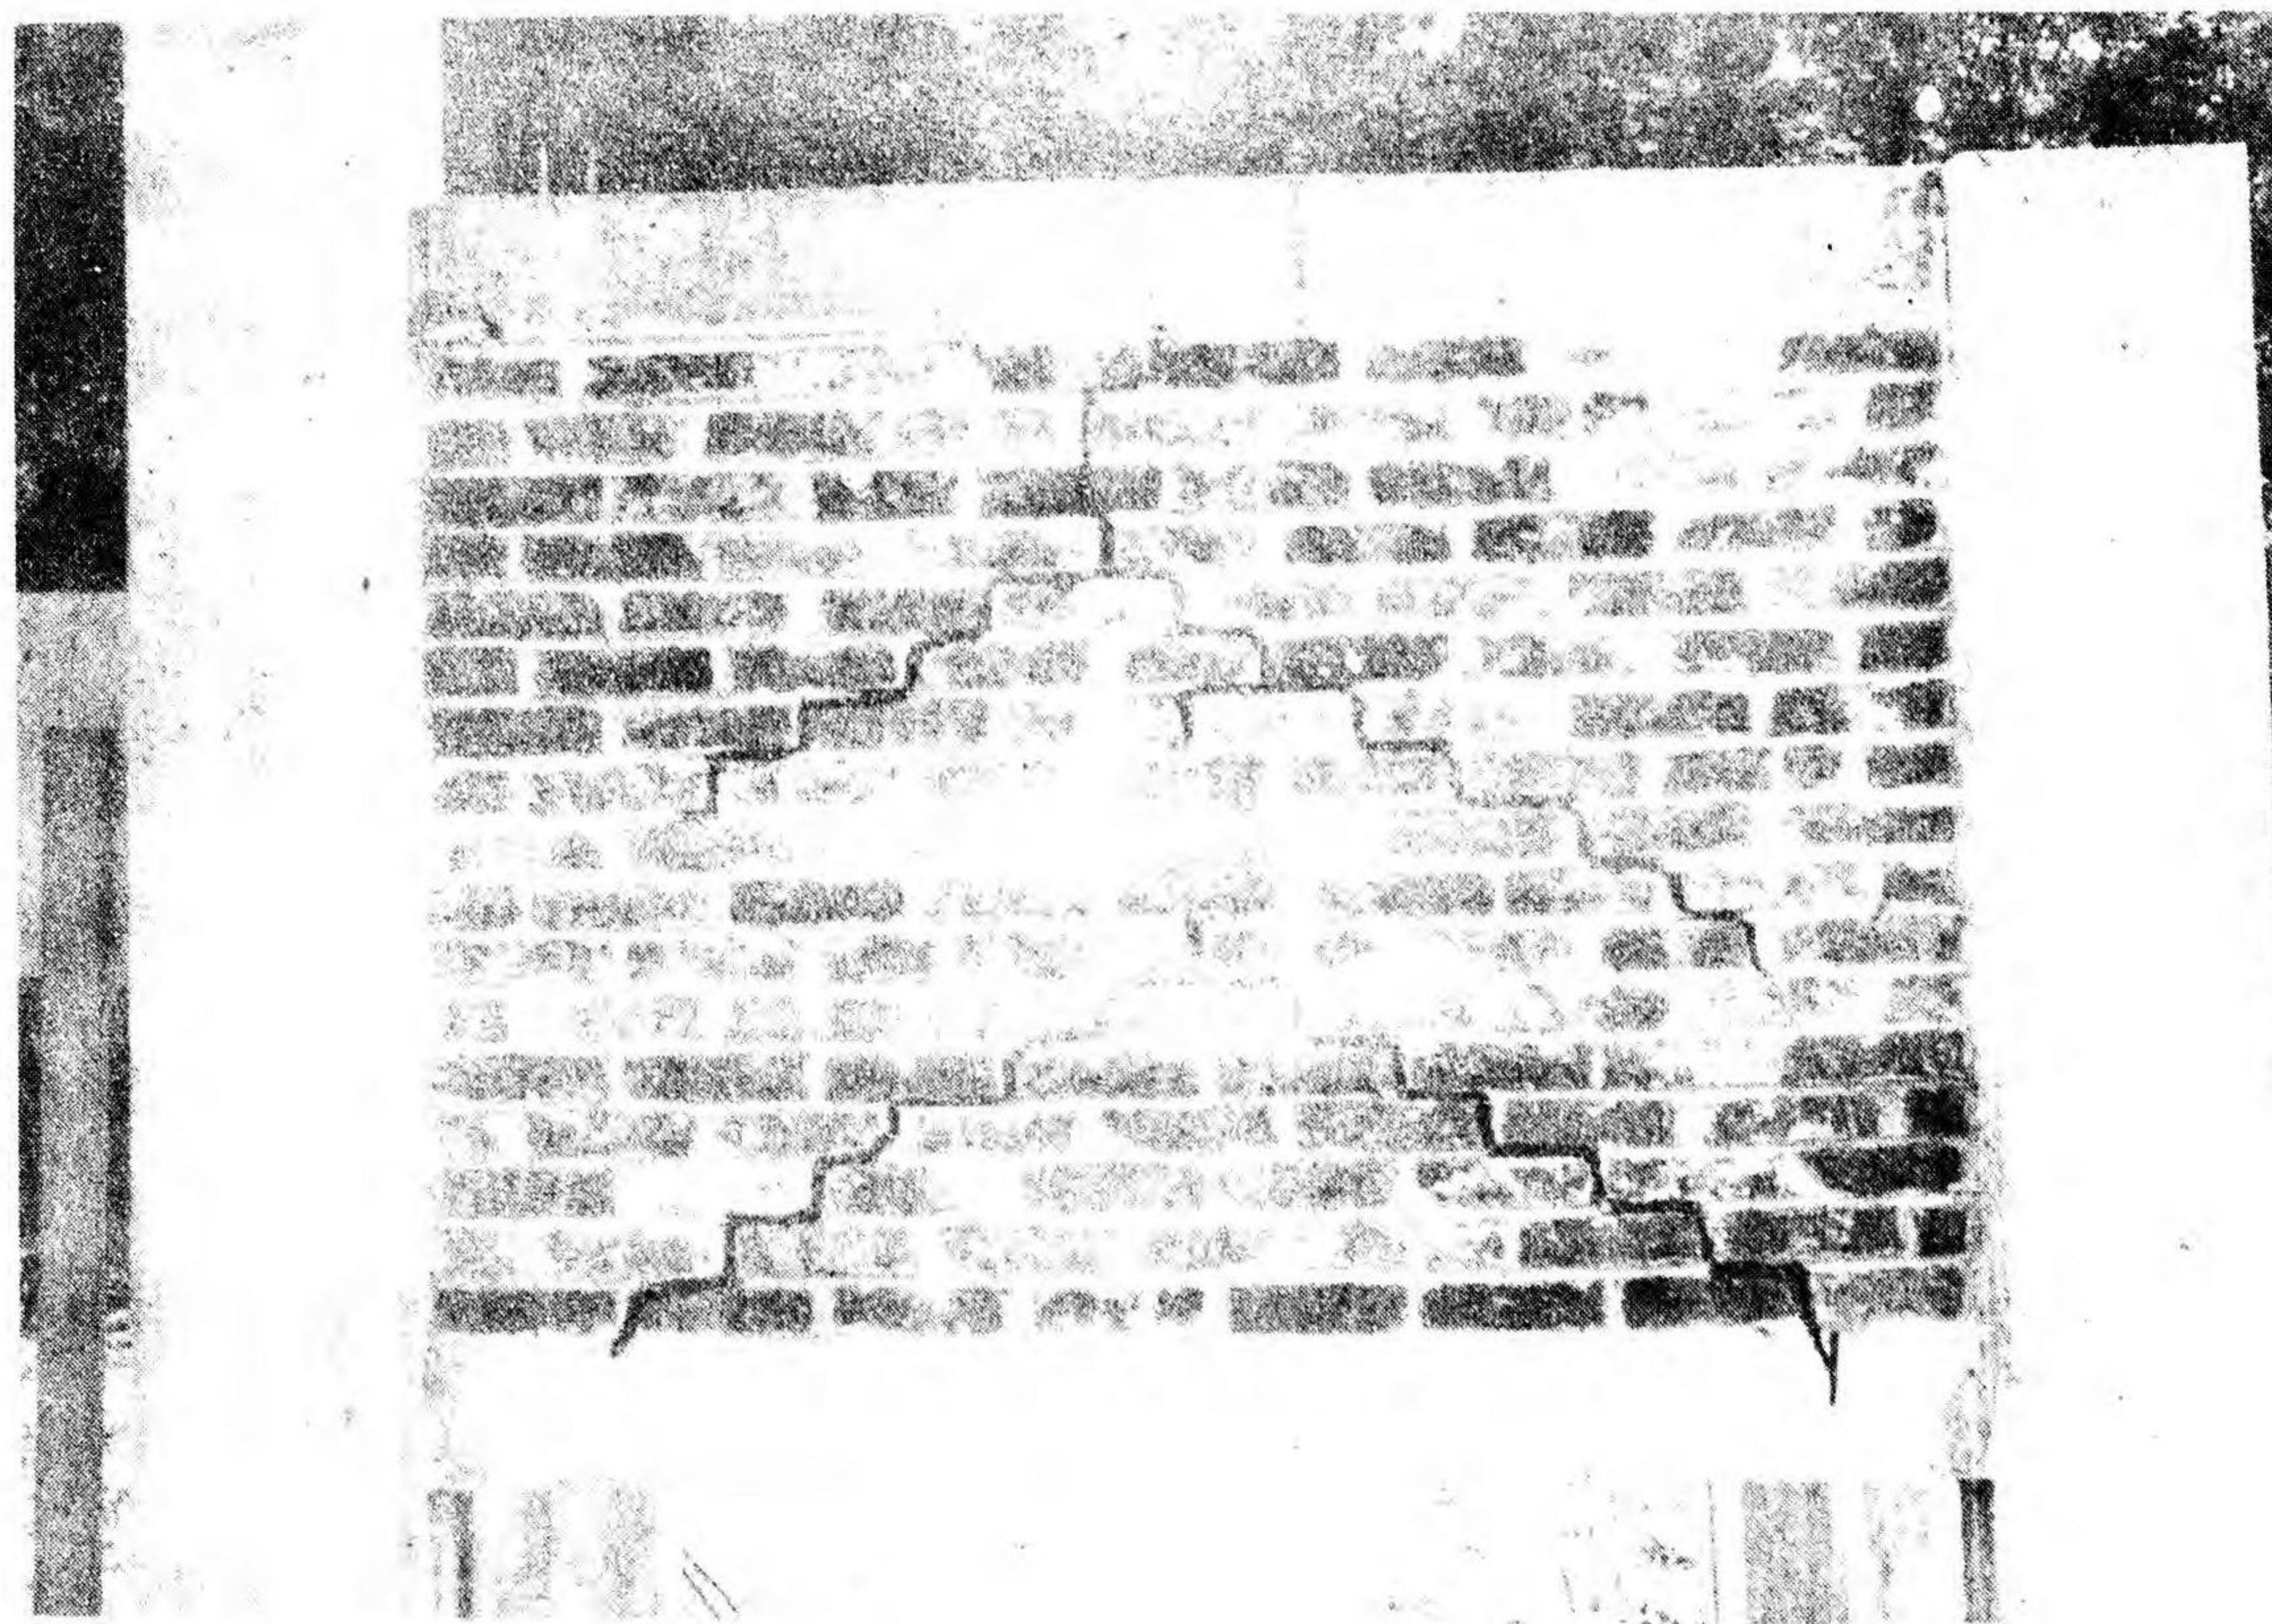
East wall of test structure after detonation of one 22-gm pellet of Tetryl.
